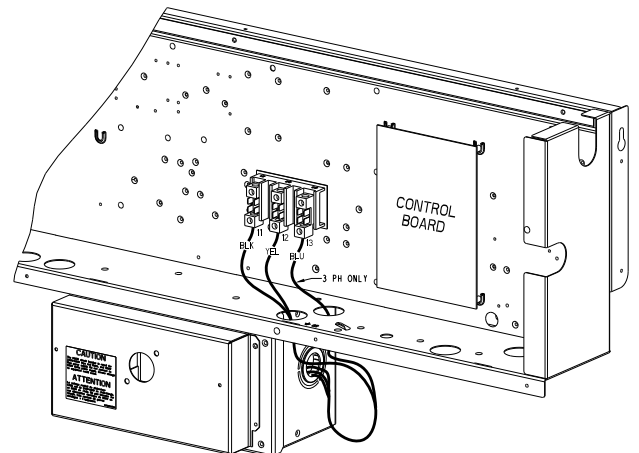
Location of HACR Circuit Breaker Enclosure
